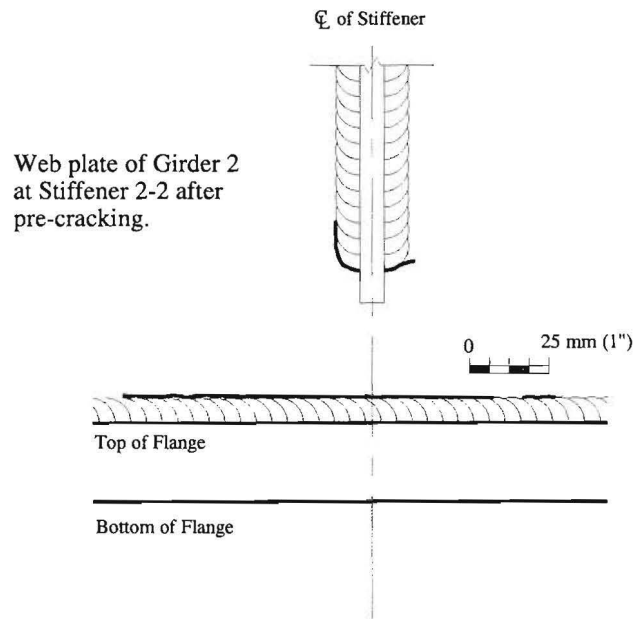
Pre-cracking in web plate of Girder 2 at weld toe of Stiffener 2.
